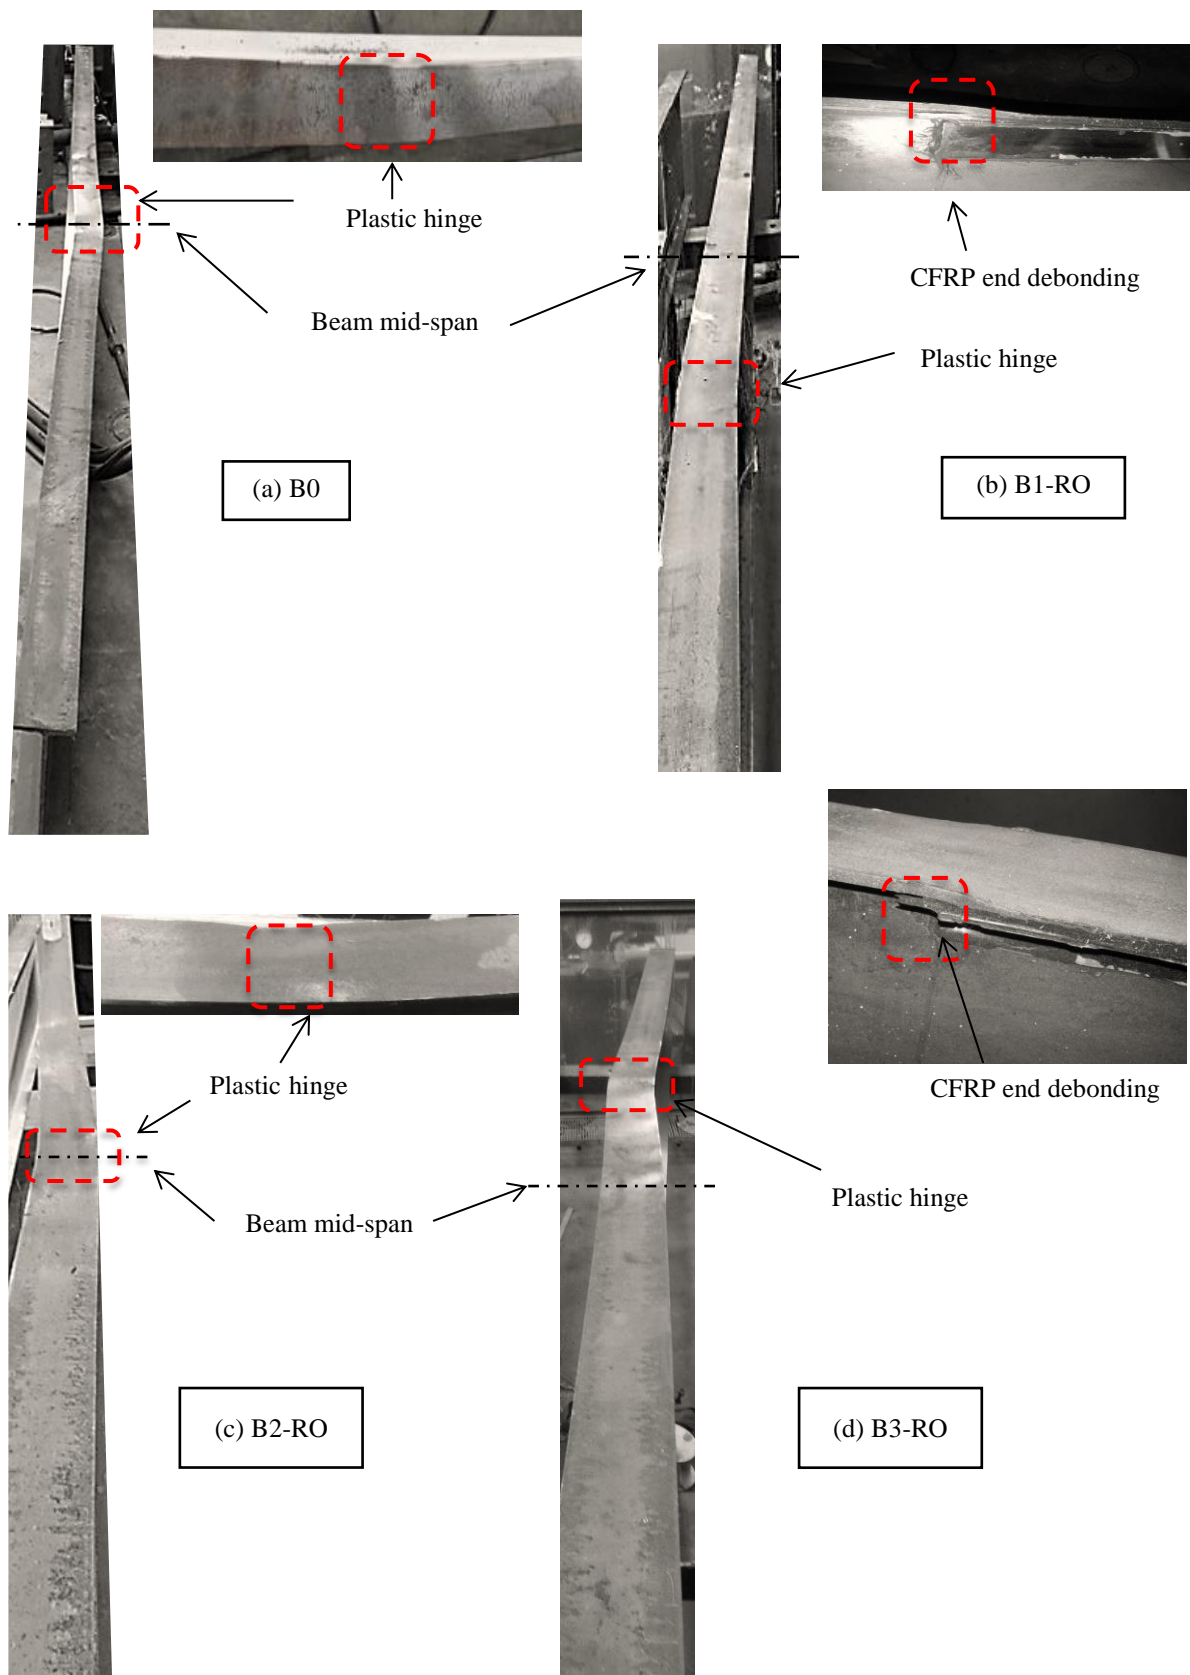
Failure patterns for Specimens B0 & B1-RO to B3-RO.
